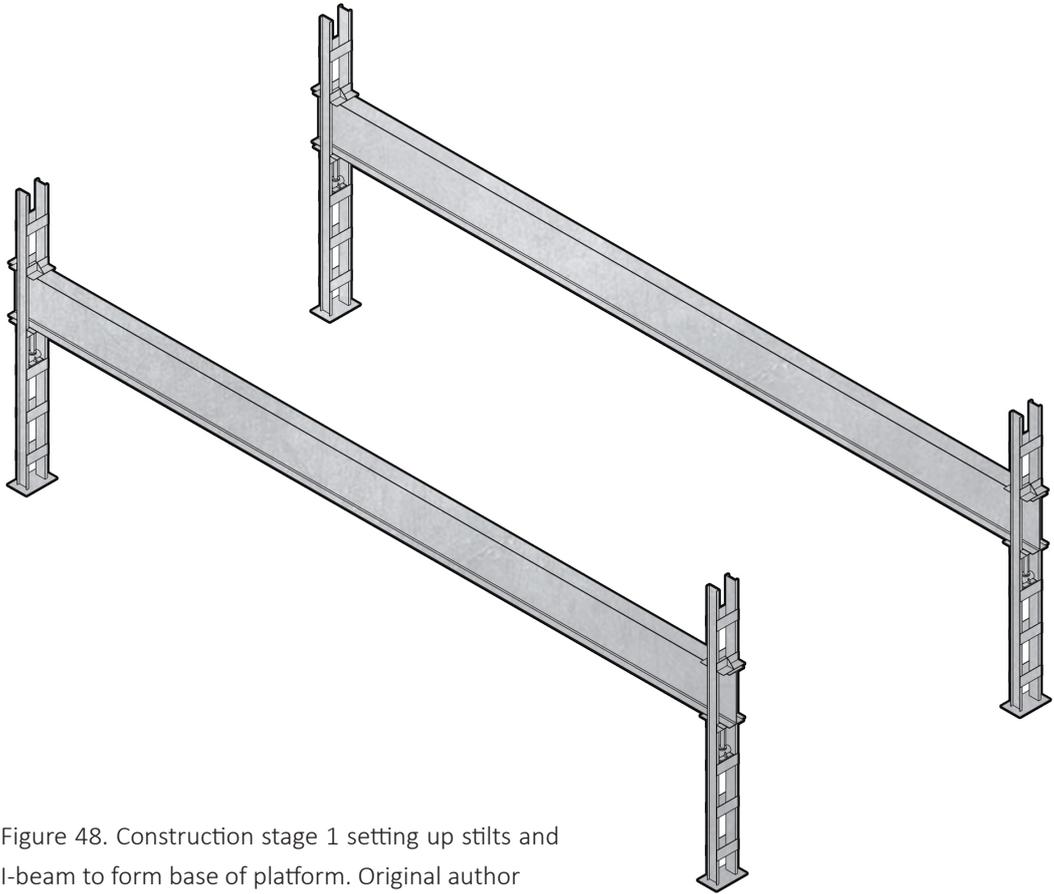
Construction stage 1 setting up stilts and I-beam to form base of platform. Original author
